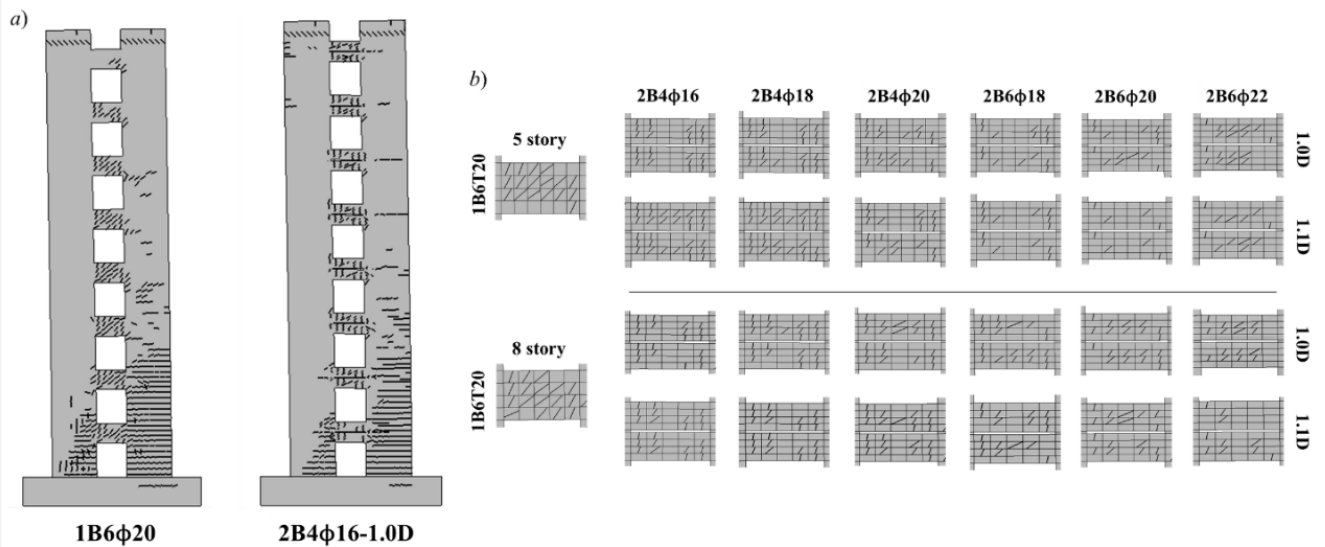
Cracking pattern for models with single and divided beams; a) piers (1.5% drift); b) coupling beams (0.5% drift).
